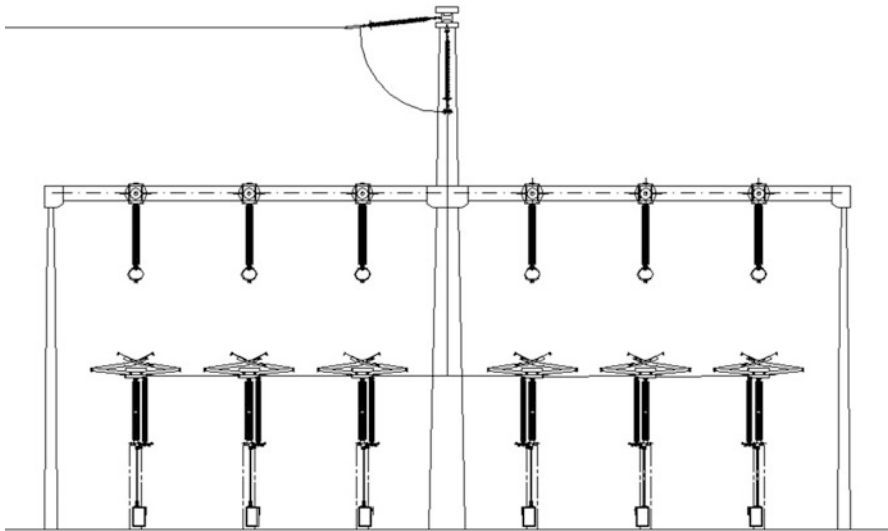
Connection with pantograph disconnector to rigid connection: elevation drawing (Carlos 1991)
